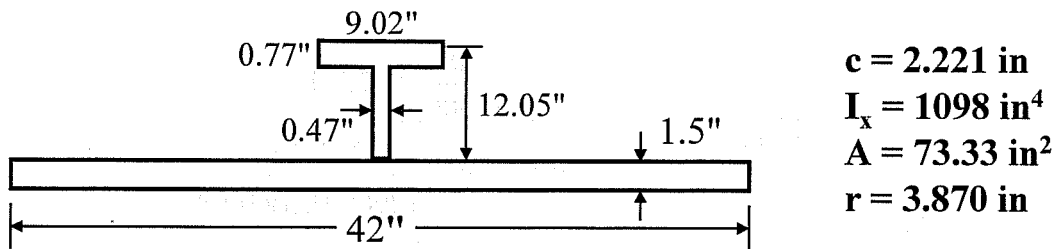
Stiffener Strut of 84 in. x 1.5 in. Plate Stiffened with WT 12x42
